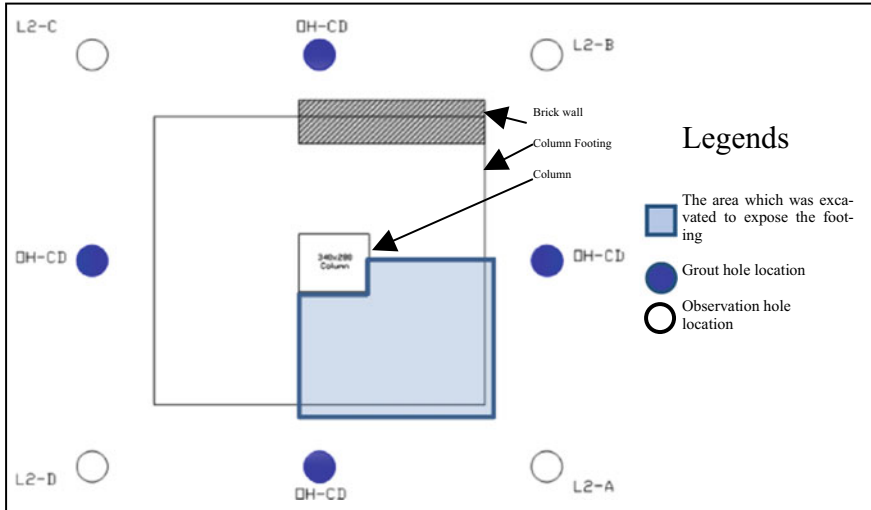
Grout hole and observation hole locations of typical footings (plan view)
